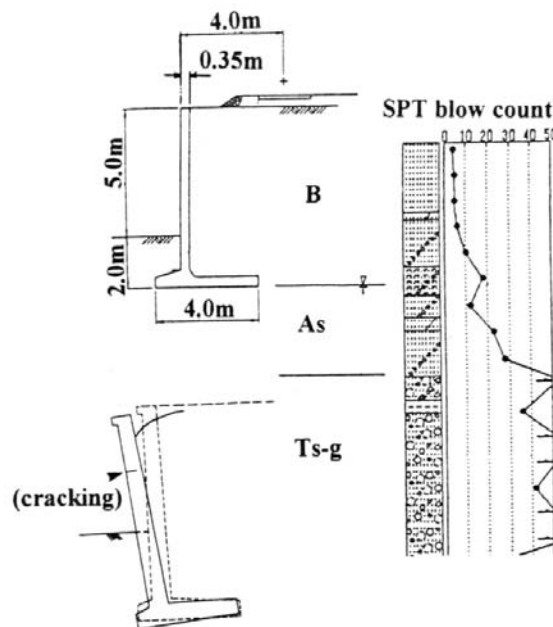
Cracking Pattern of Retaining Wall.
